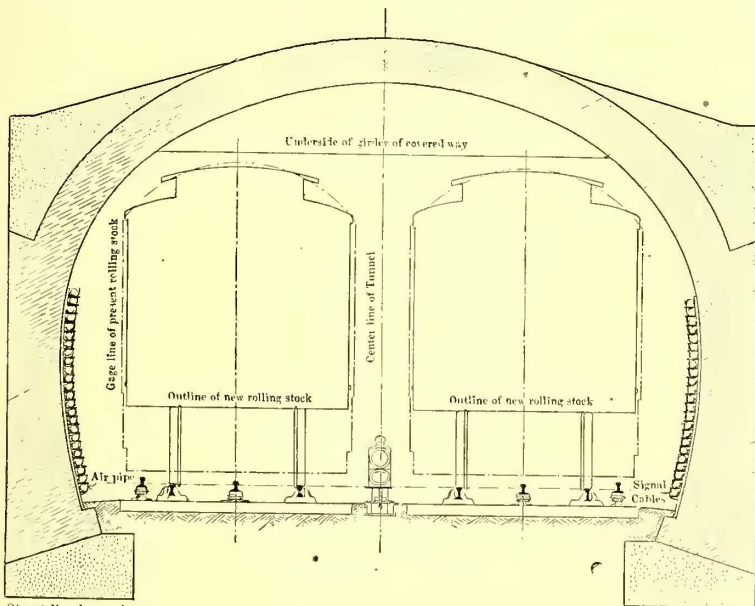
CROSS SECTION OF DISTRICT RAILWAY TUNNEL, SHOWING ARRANGEMENT OF CONDUCTOR RAILS AND HIGH-TENSION CABLES ON TUNNEL WALLS
